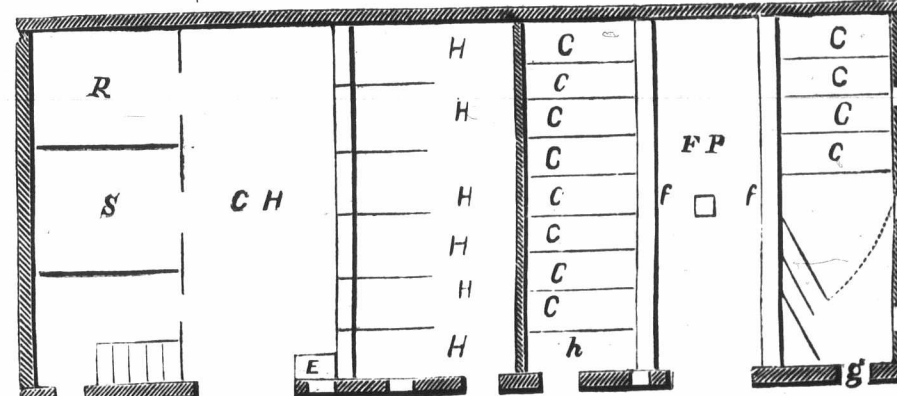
PLAN OF THE BASEMENT FLOOR.
